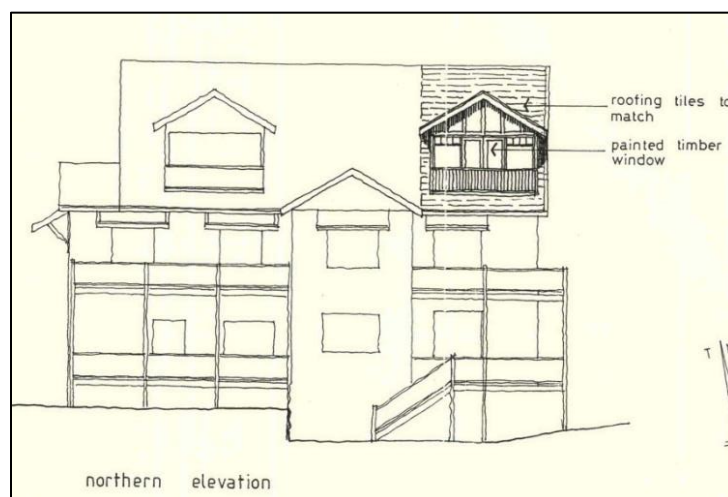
Northern elevation of No. 80 Cairo Street, showing the unbuilt first floor western roof extension and balcony dormer as approved under DA 1136/97.
